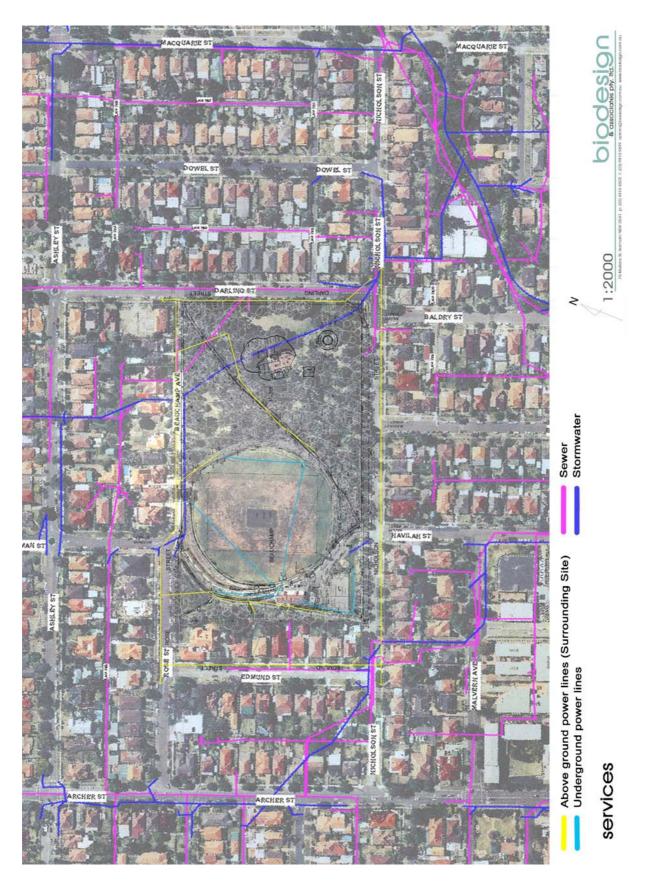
Plan showing the sewer and stormwater system servicing Beauchamp Park. Power services are also shown.
